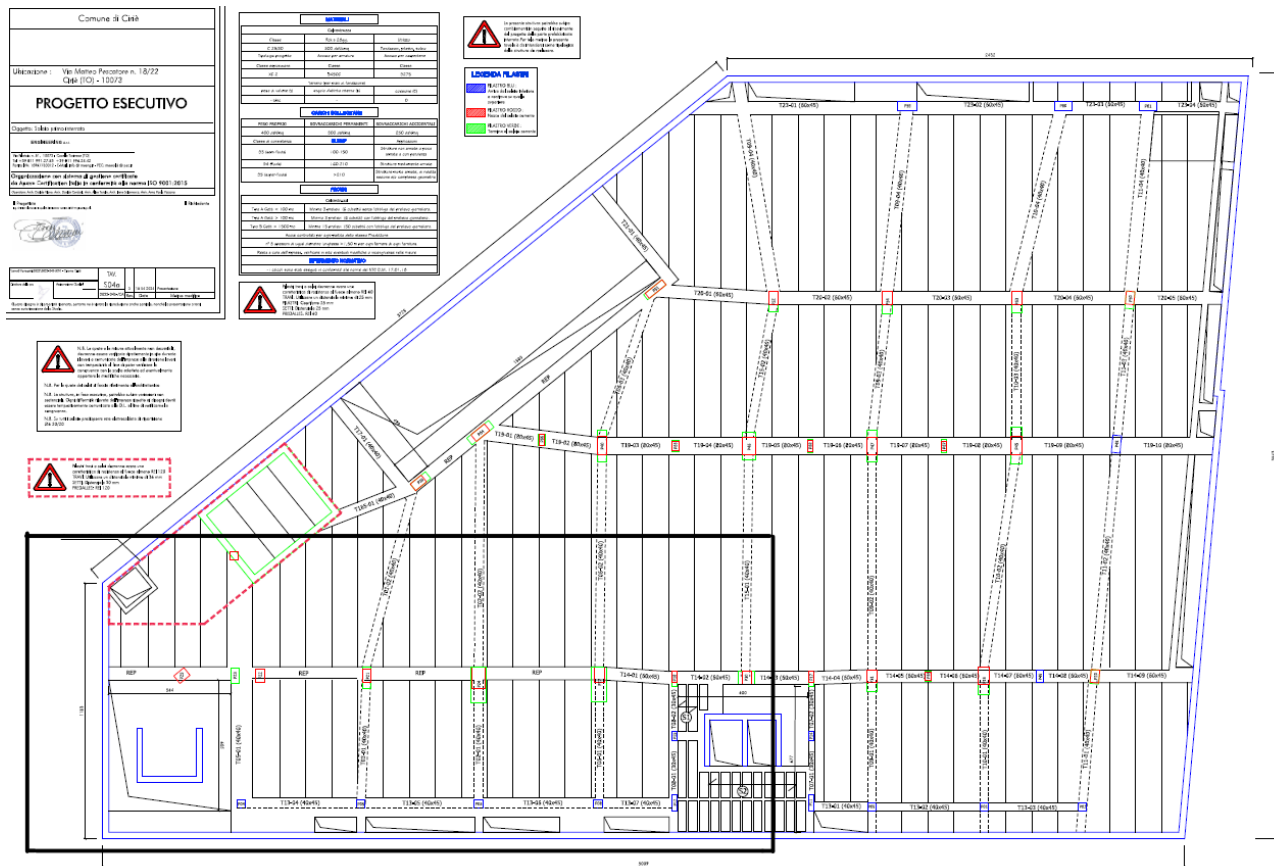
Structural design plan of “floor -1” to highlight the portion considered in the example in Figure 117.
